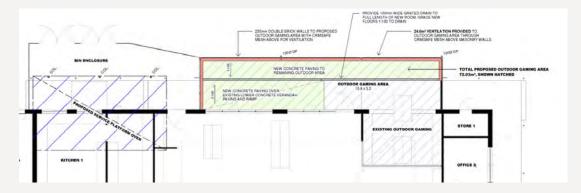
Proposed new outdoor gaming area (Source: Rob Pickett Design 2024)
